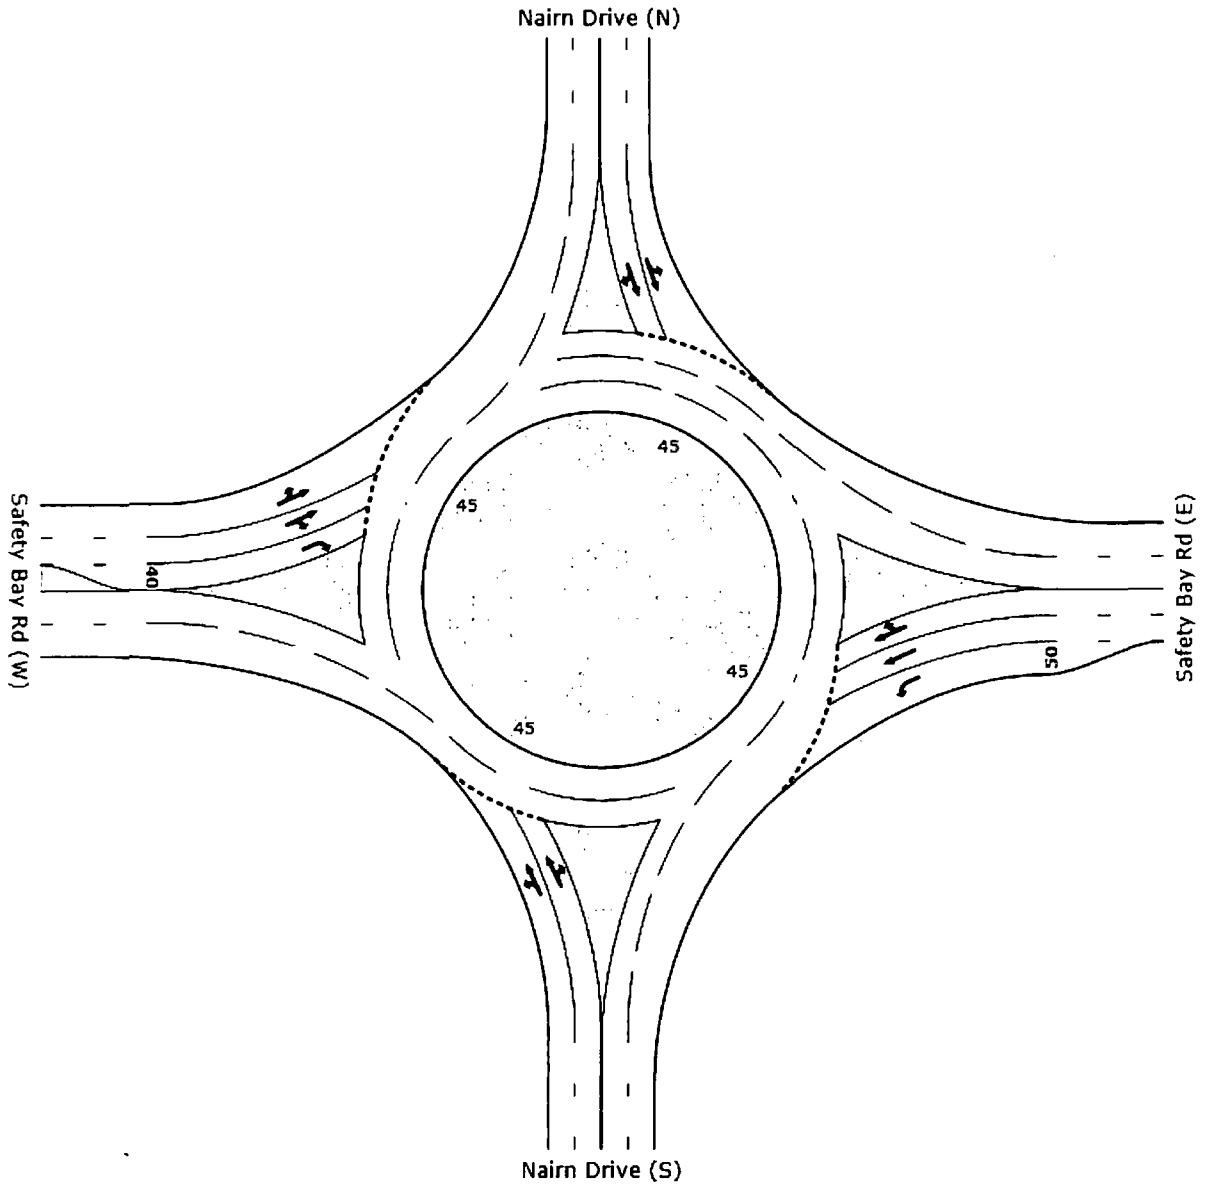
Safety Bay Road / Nairn Drive roundabout layout (widened)
